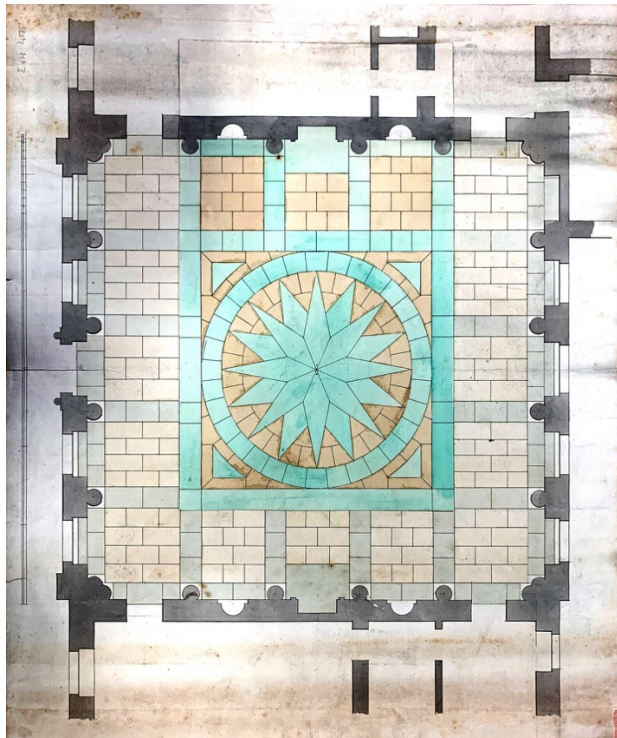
Plan for floor of the Hall, Wentworth Woodhouse, n.d. WWM MP 3.
